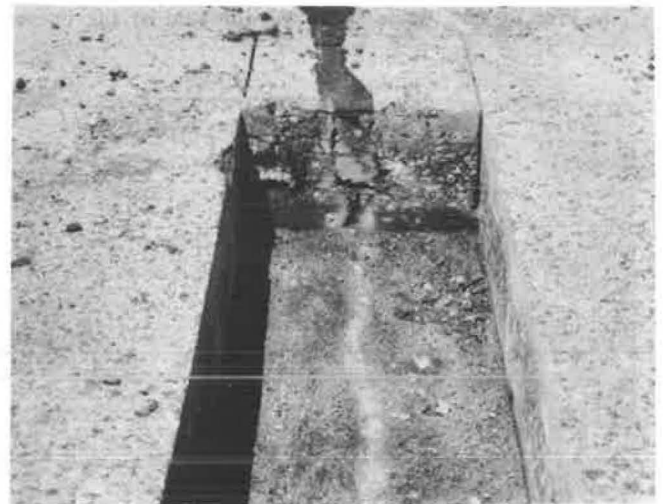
Sealed transverse crack original deterioration stopped or retarded from progressing upward on Highway 17, sealed test section with Hydrotech 6160.
